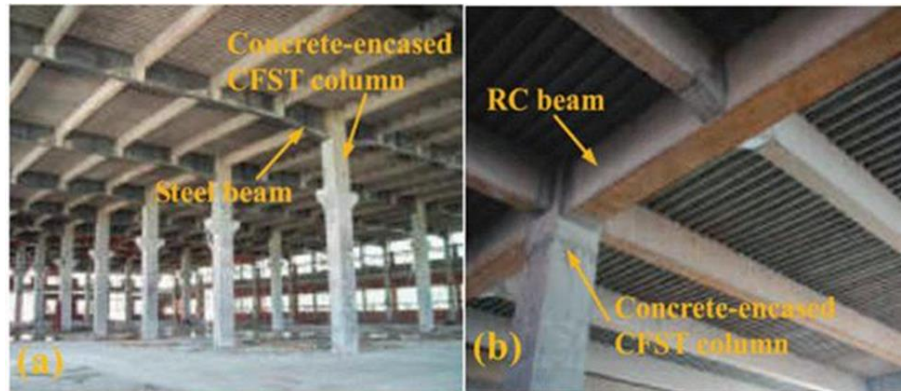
CE-CFST columns to beam joint; (a) columns to steel beam connection; (b) columns to RC beam connection [12].
